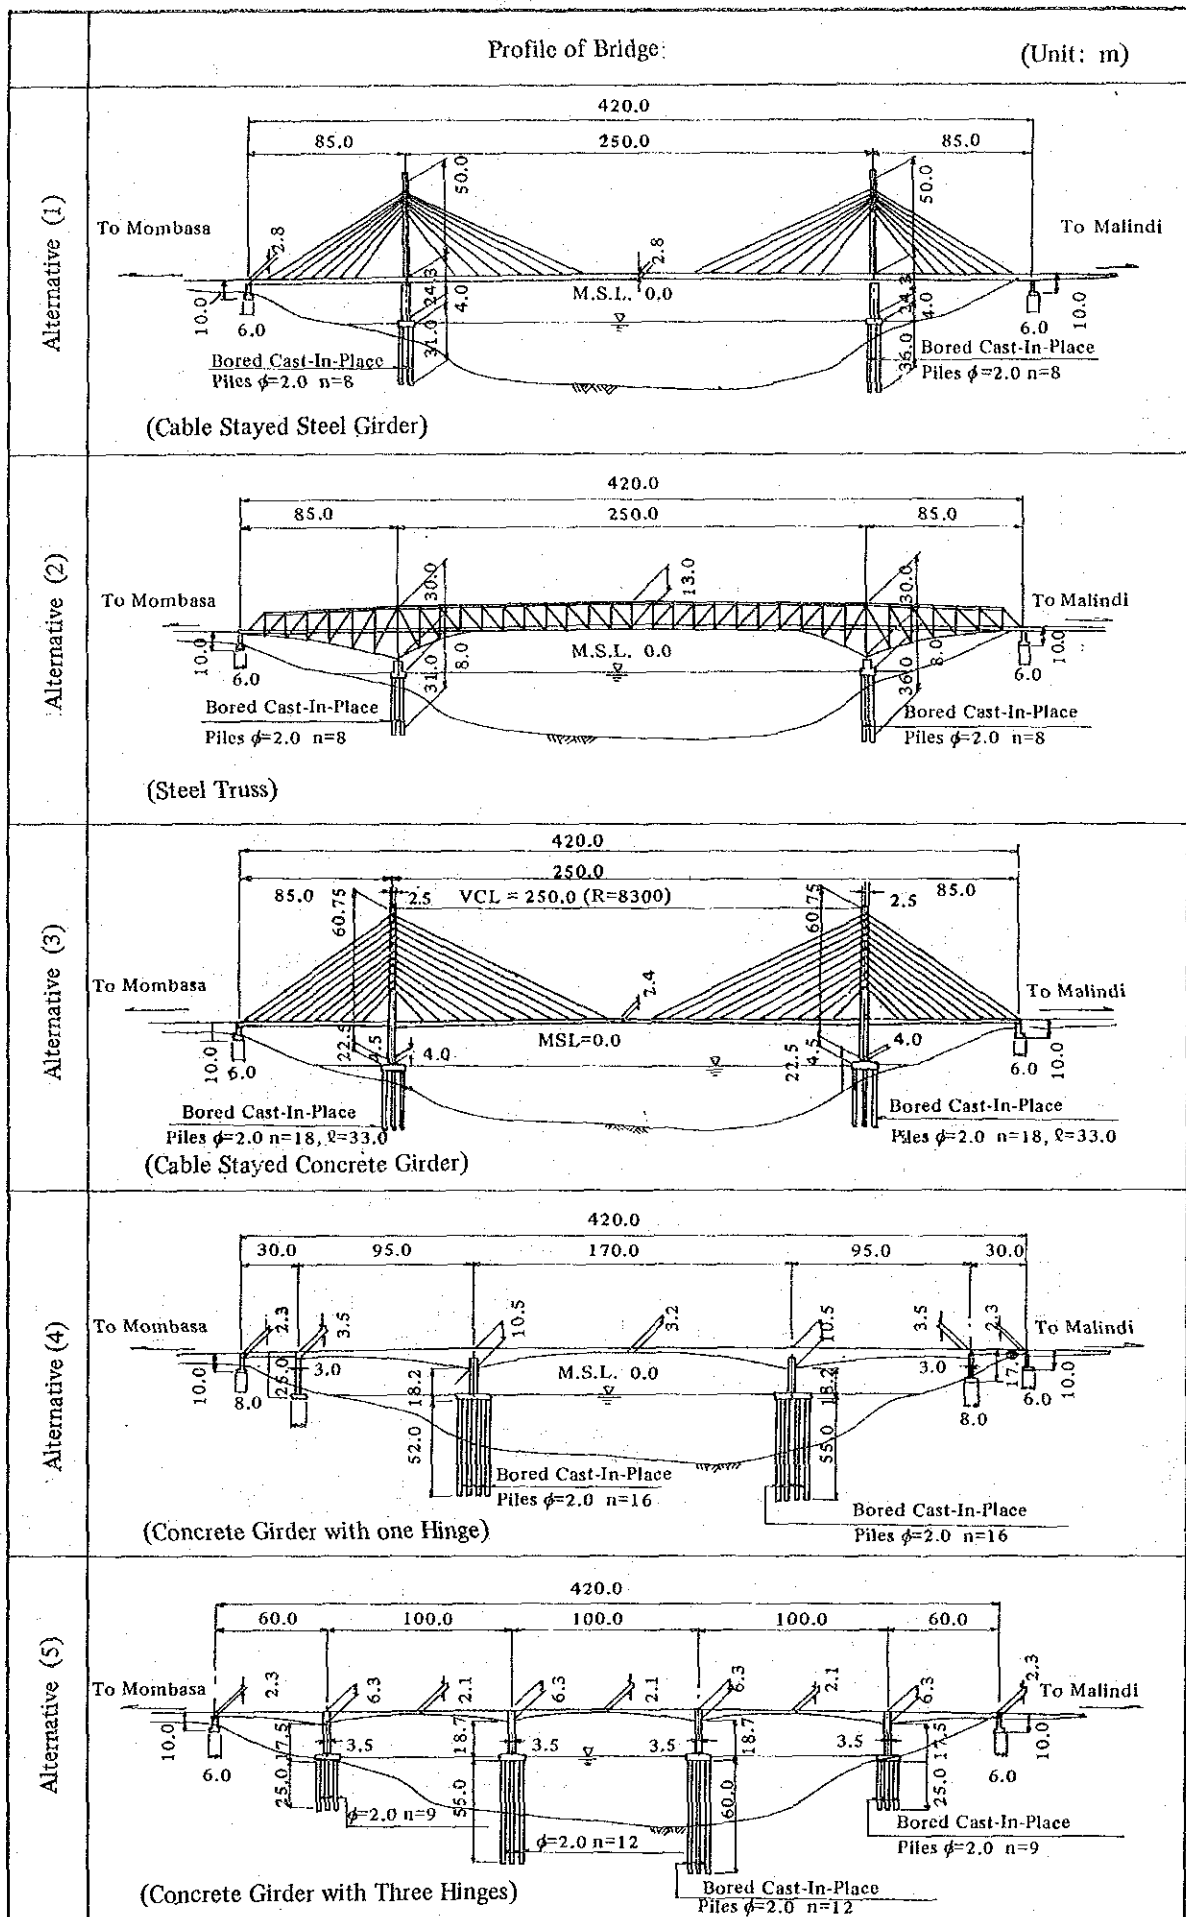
ALTERNATIVE BRIDGE PLAN
